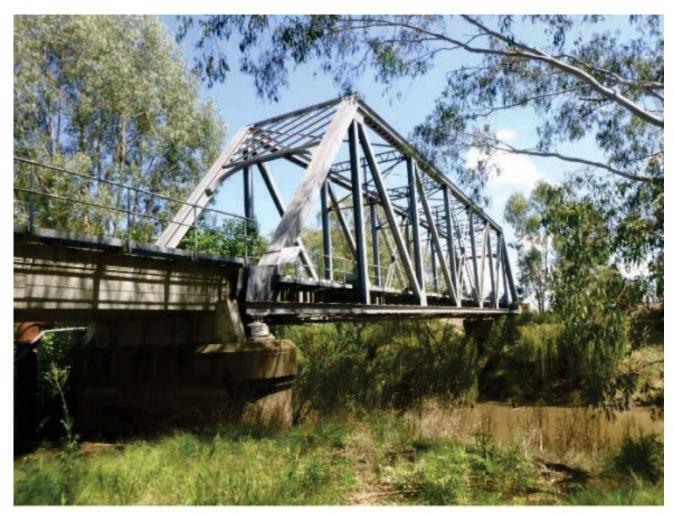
EXISTING LACHLAN RIVER BRIDGE TRUSS STRUCTURE FROM THE SOUTH
